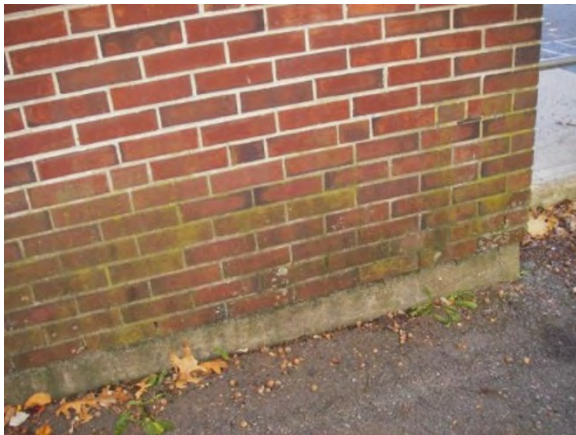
REAR BUILDING EXTENSION, NORTHEAST CORNER
